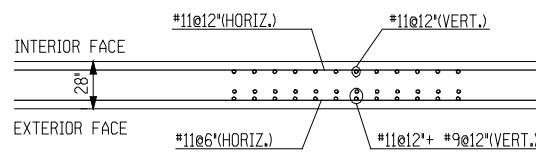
R/B ~~Critical Sections~~Plan View (Sheet 2 of 2)
